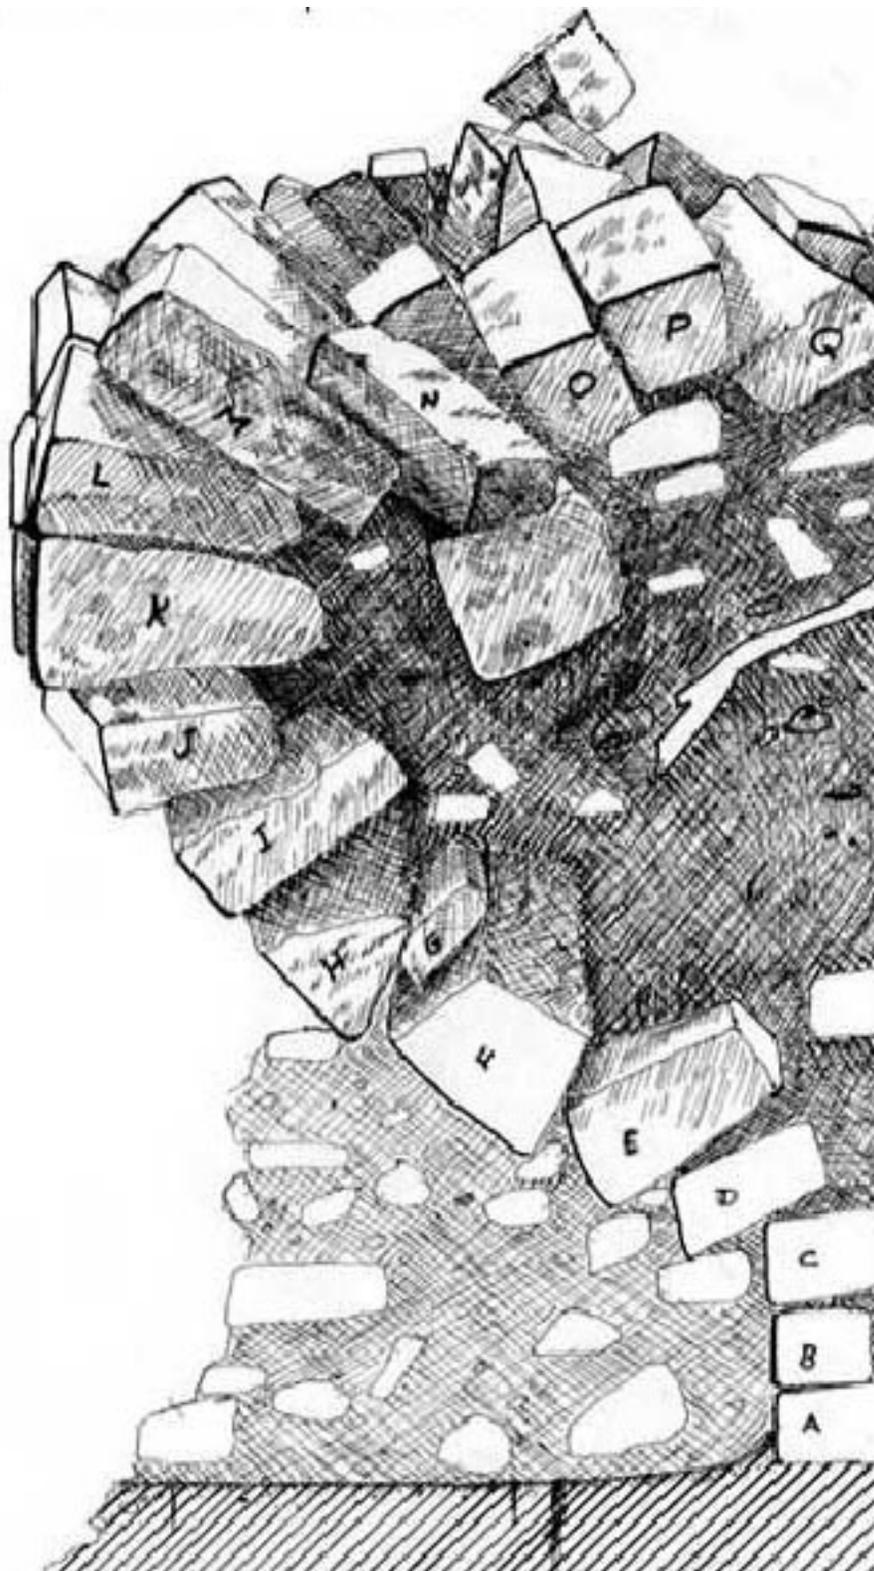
Cross section: Element No. 9, Structure 10L-22, Copán.
